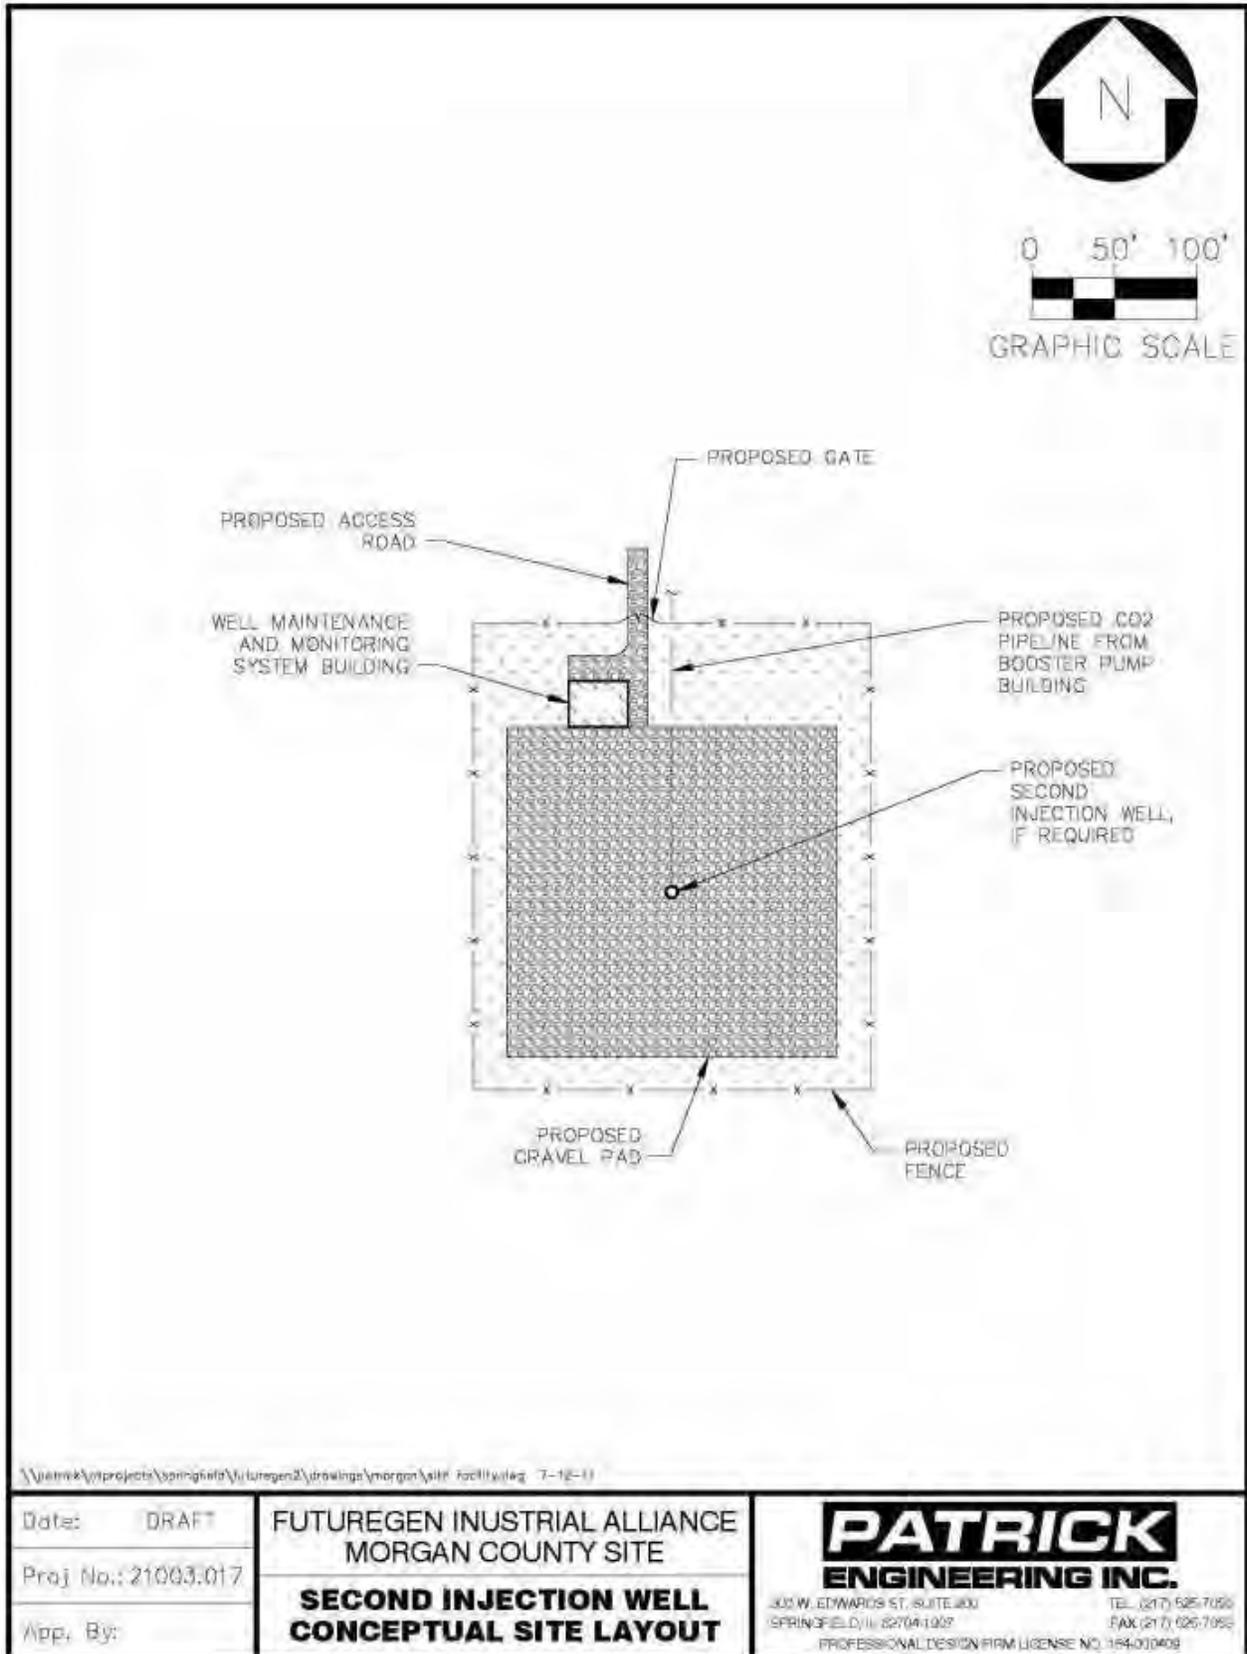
Secondary Injection Well Site Surface Features Conceptual Layout
